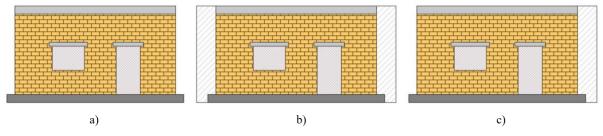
Building arrangement, showing: a) separate structures, b) an adjacent middle or corner, c) an adjacent edge
